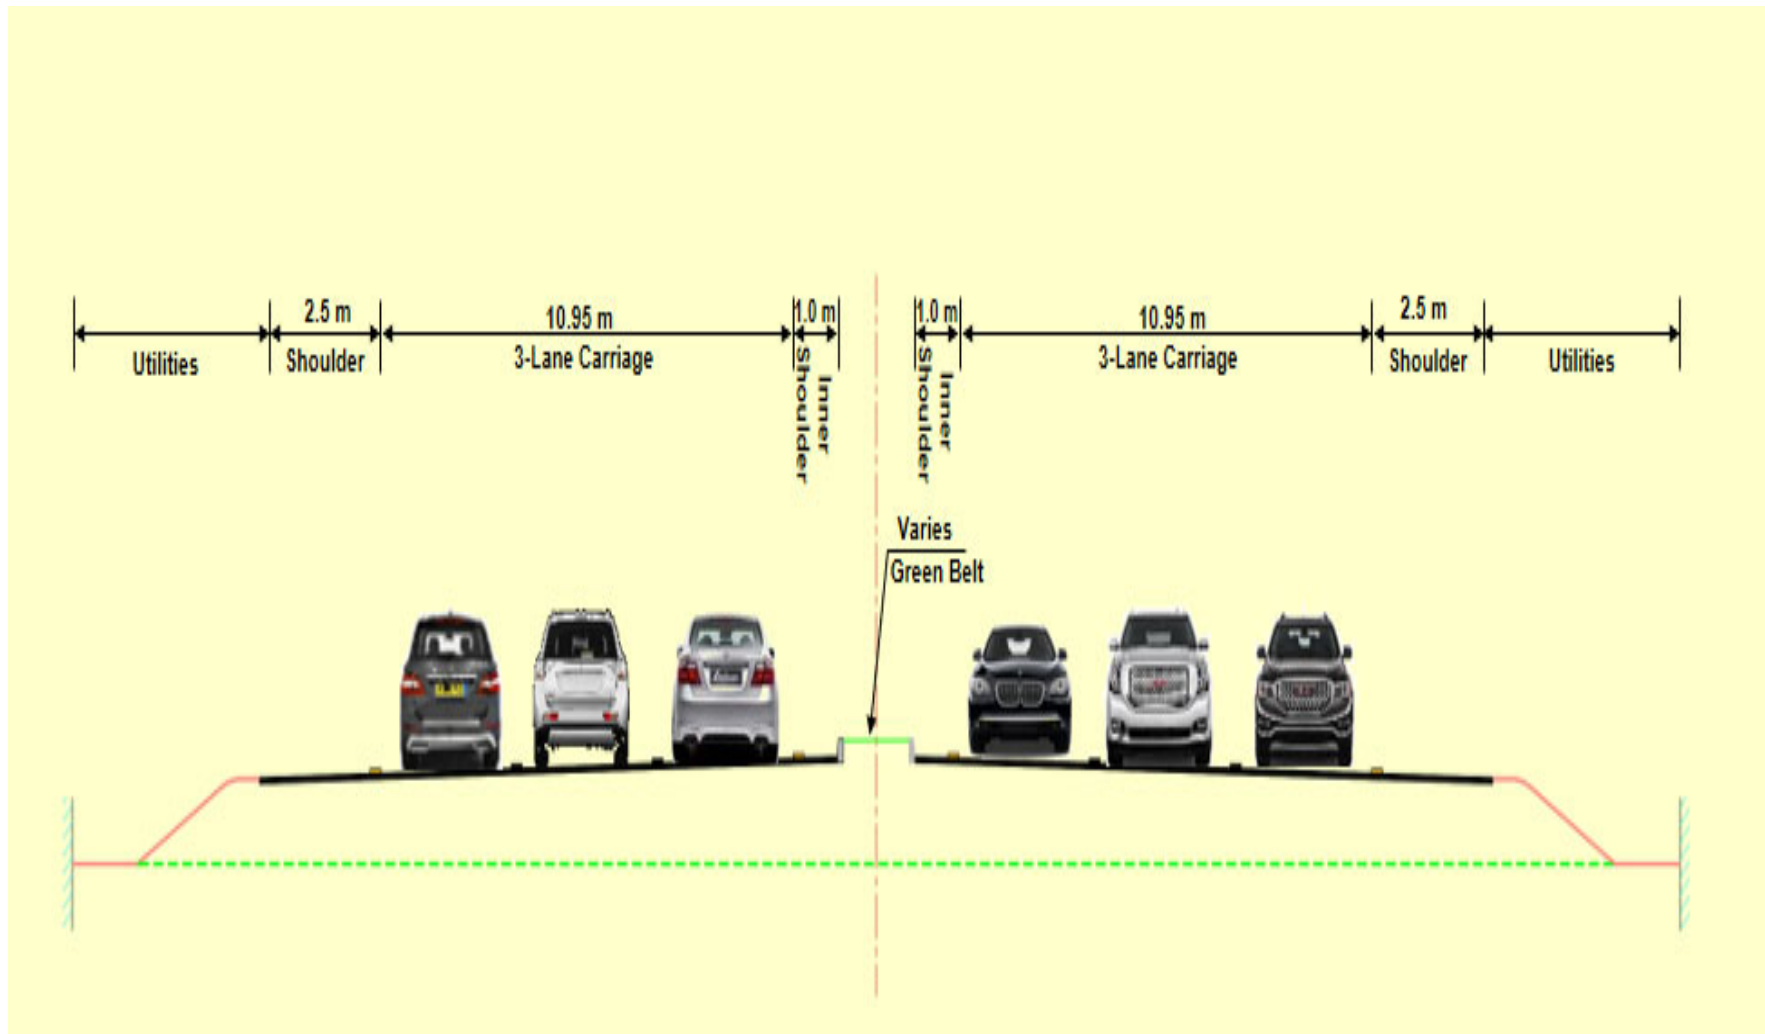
Typical Cross Section of the 3 Lane Road Without Service Road
